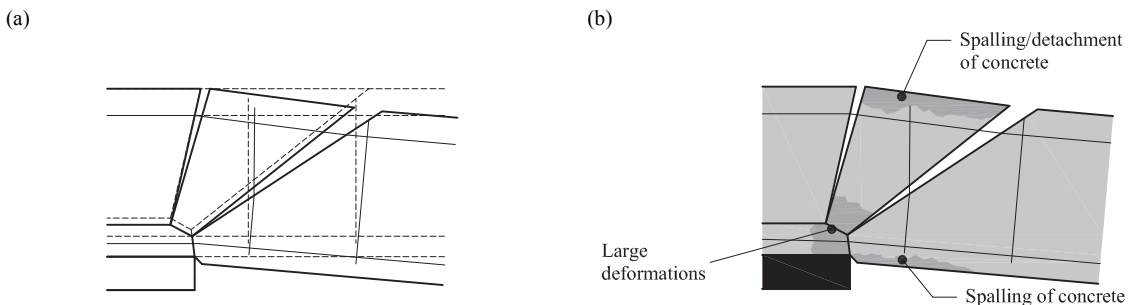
Assumed deformed shape of the slab specimen close to failure
